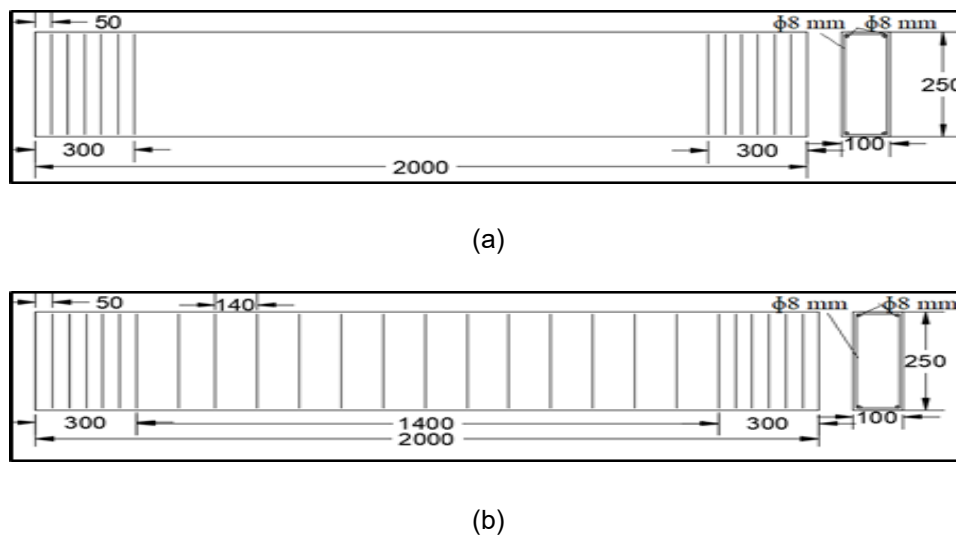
Reinforcement Details of Beams: a) (BN, BSSFF, BSSFT, BSHFTa, BSHFTb, (b) Reinforcement Details of Beam (BW)
